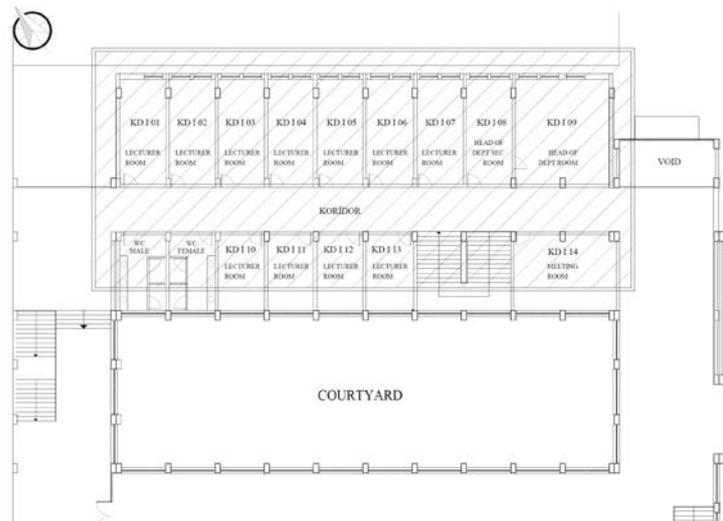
ESTU Industrial Engineering Department First Floor Plan
